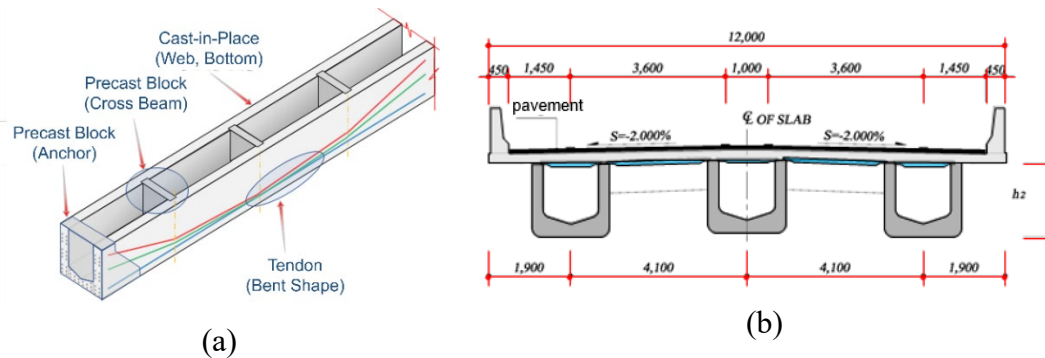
Configuration and conceptual diagram of the pre-tensioned U-type girder for the (a) unit girder (precast and cast-in-place) manufacturing method and (b) closed bridge section
